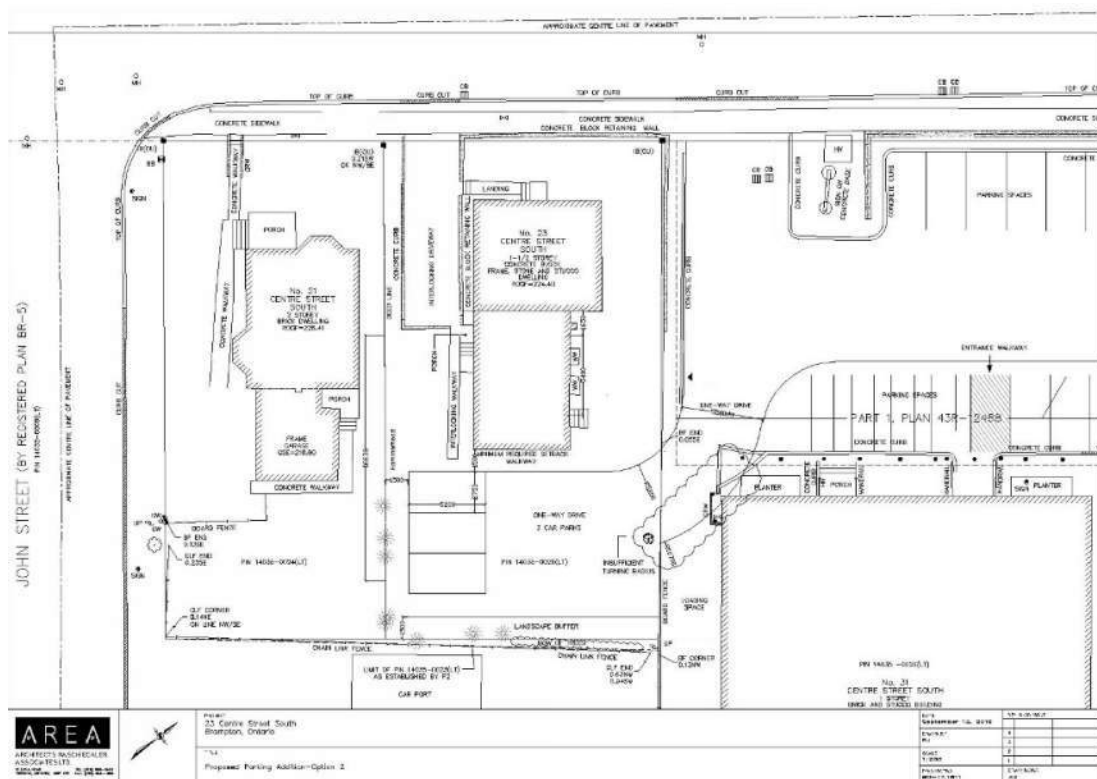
Option 2: Site Plan Drawing showing proposed additional parking direct-access retaining the rear wing
